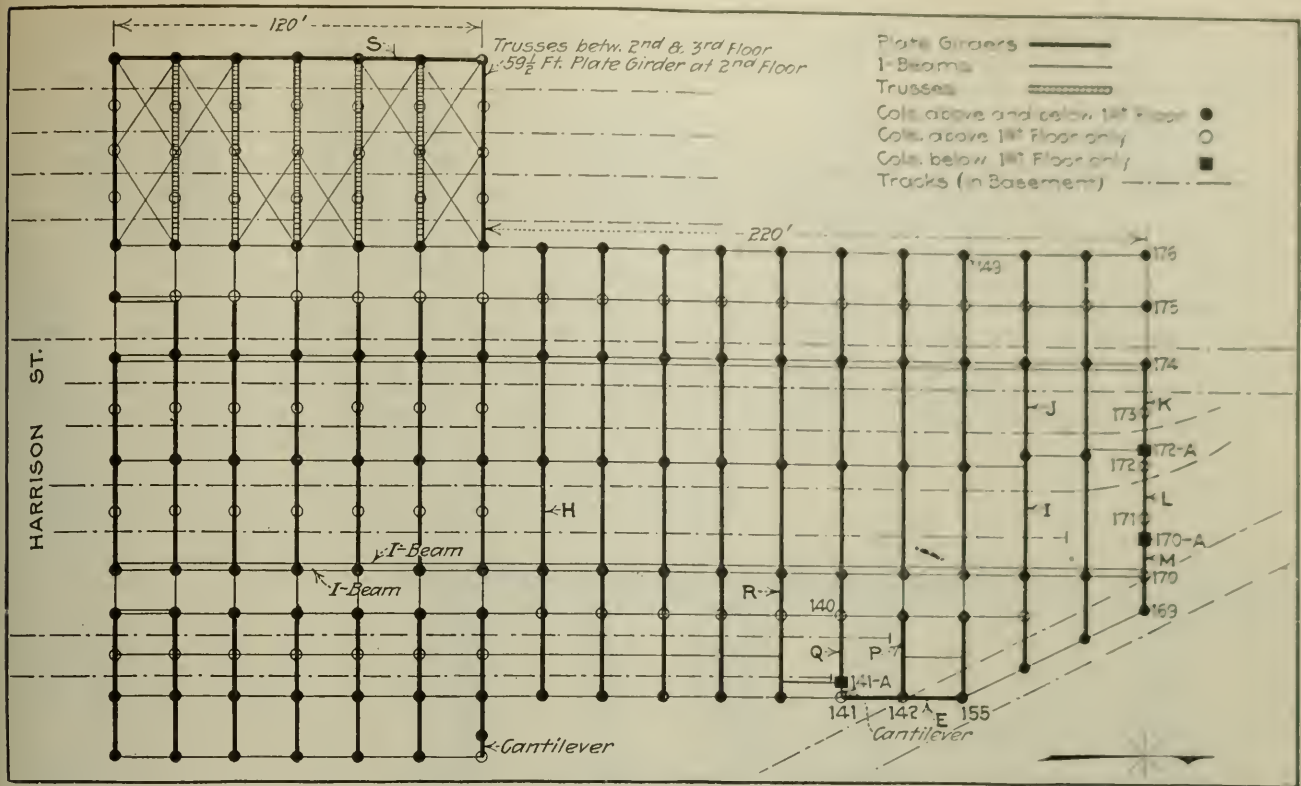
FRAMING PLAN OF FIRST FLOOR
